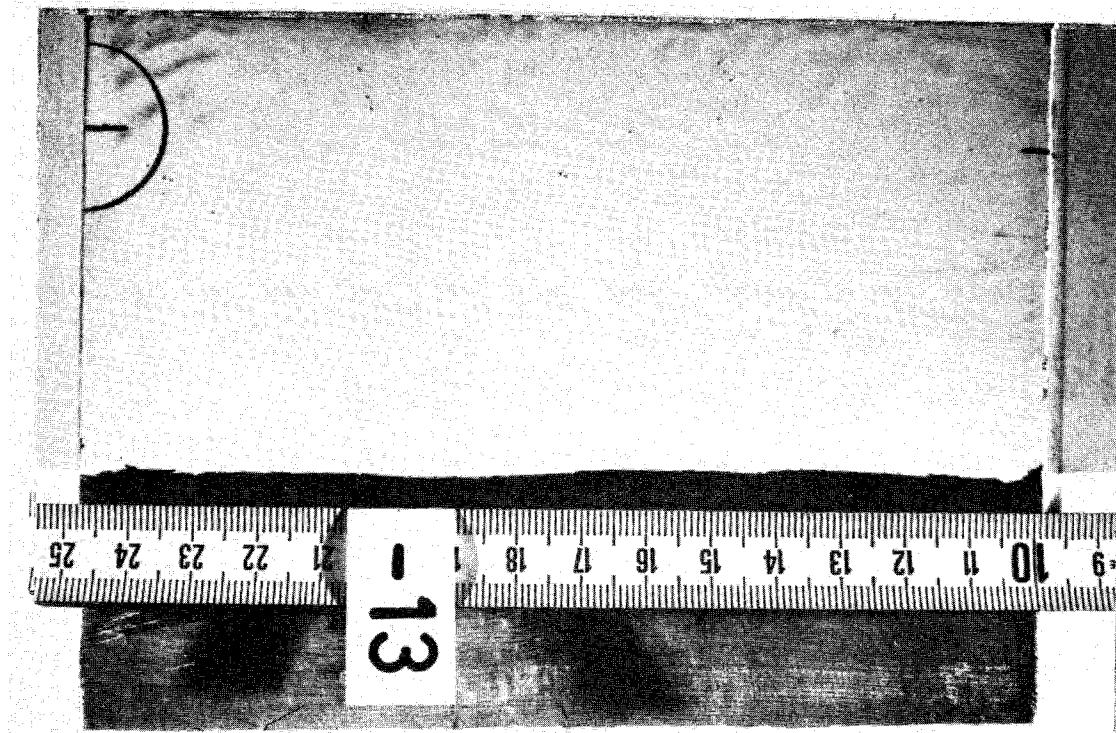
Specimen No. 13 : crack offset : - 19 mm
